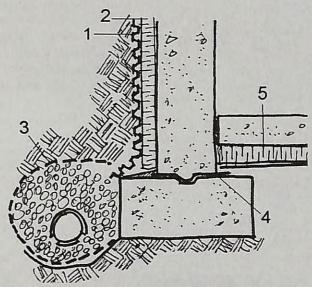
The better built basement wall. Exterior basement insulation (2) protected by a drainage membrane (1). The perimeter drain tile is below the footing, and the drain rock is wrapped (3) with a filter cloth to reduce sedimentation. An impermeable membrane (4) reduces moisture migration into the foundation wall. The basement slab is placed on rigid insulation over a polyethylene membrane (5).
